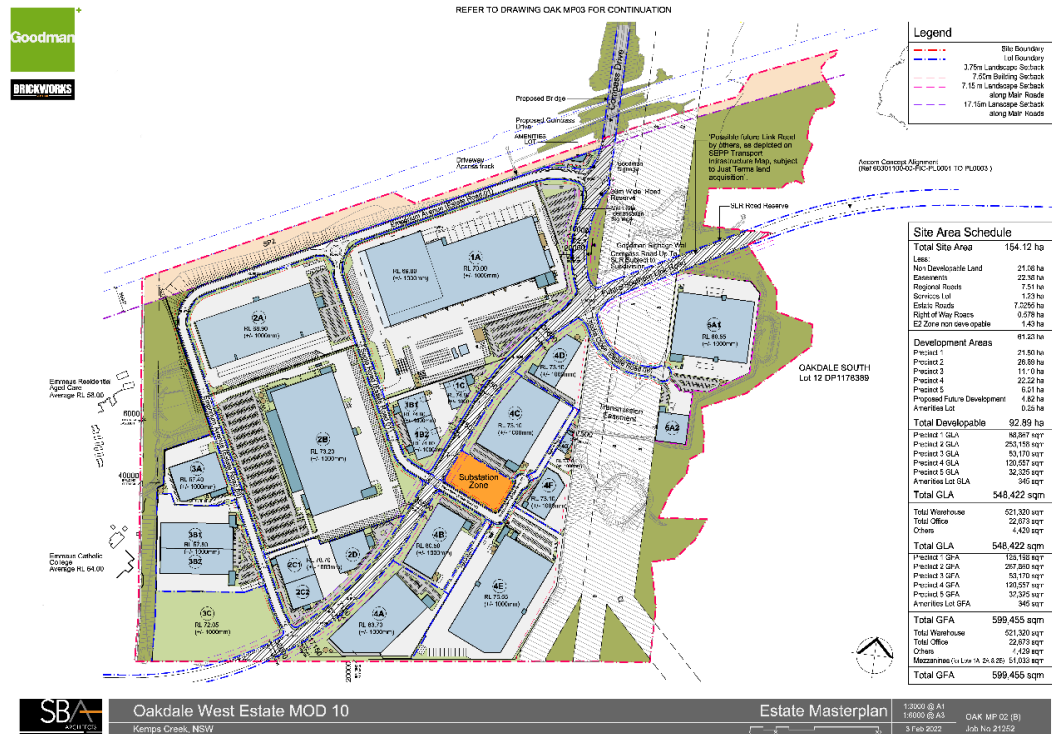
OWE Masterplan under latest modification under assessment (Mod 10) (Source: SBA Architects)
